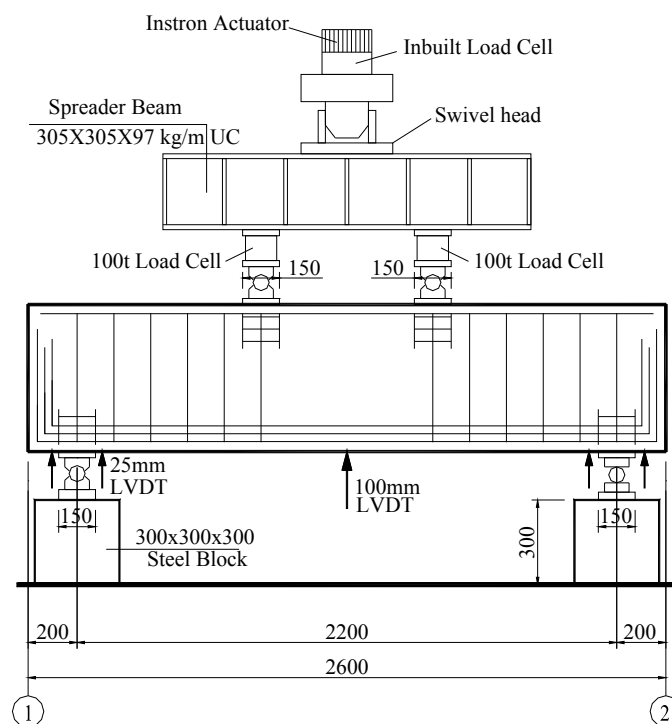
Typical Test Setup for Batch 2 Specimens
